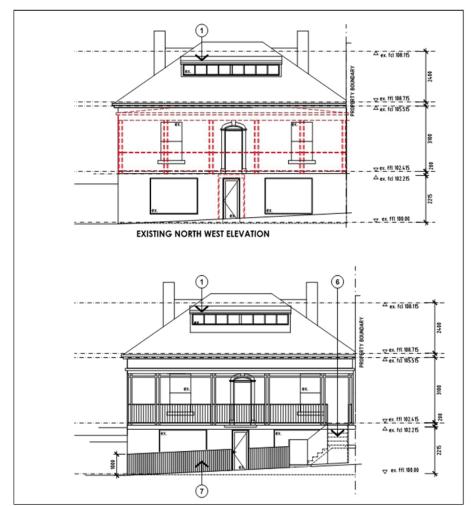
Elevations illustrating proposed demolition and alterations to Macquarie Street frontage.
